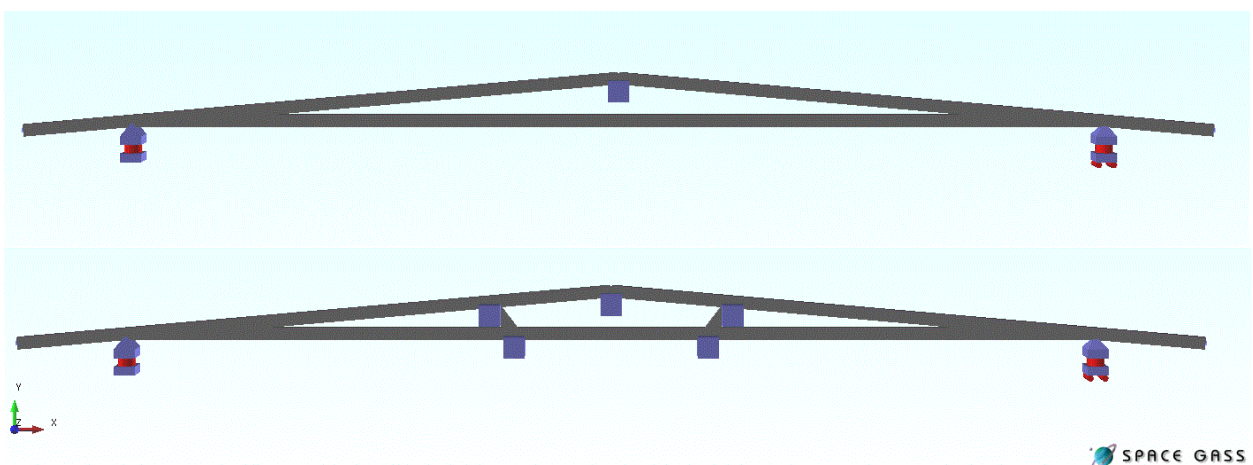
Basic structural analysis modeling of before (top) and after (bottom) upgrading a typical 1960-80s roofing structure
